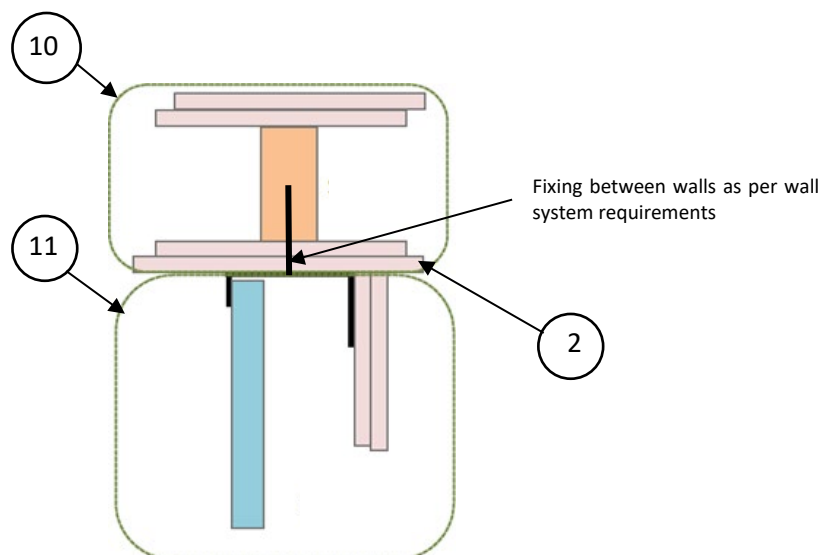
Steel stud shaft wall perpendicular interface with single stud timber partition – Plan view
